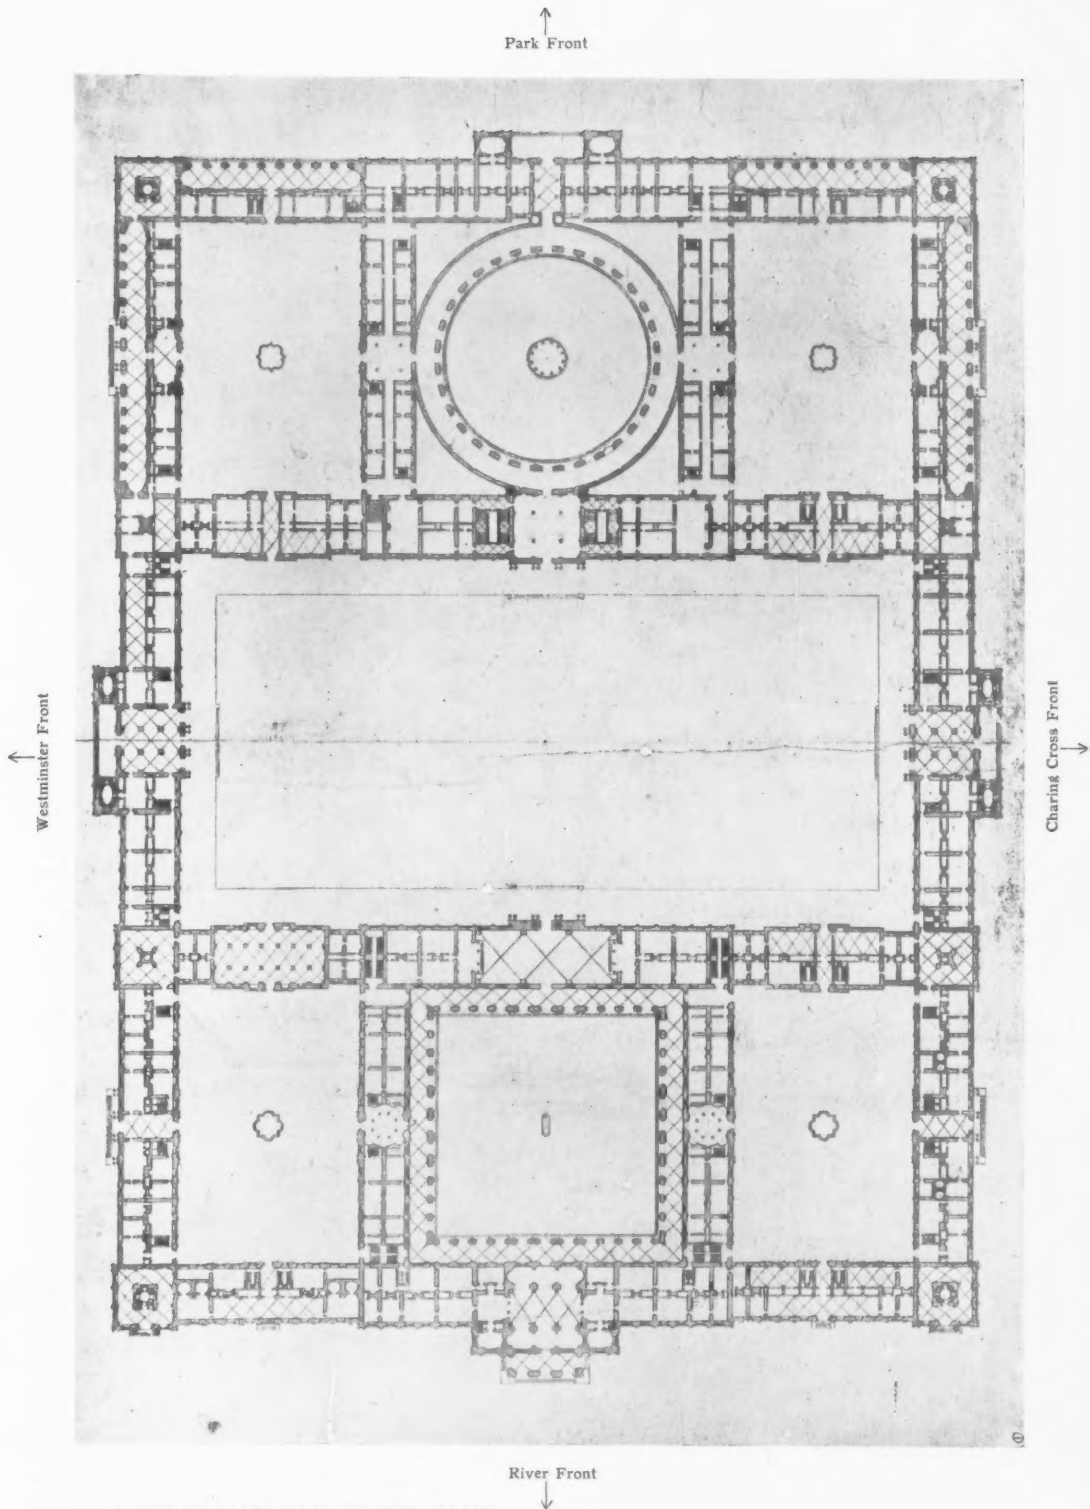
GROUND-FLOOR PLAN OF THE PALACE
